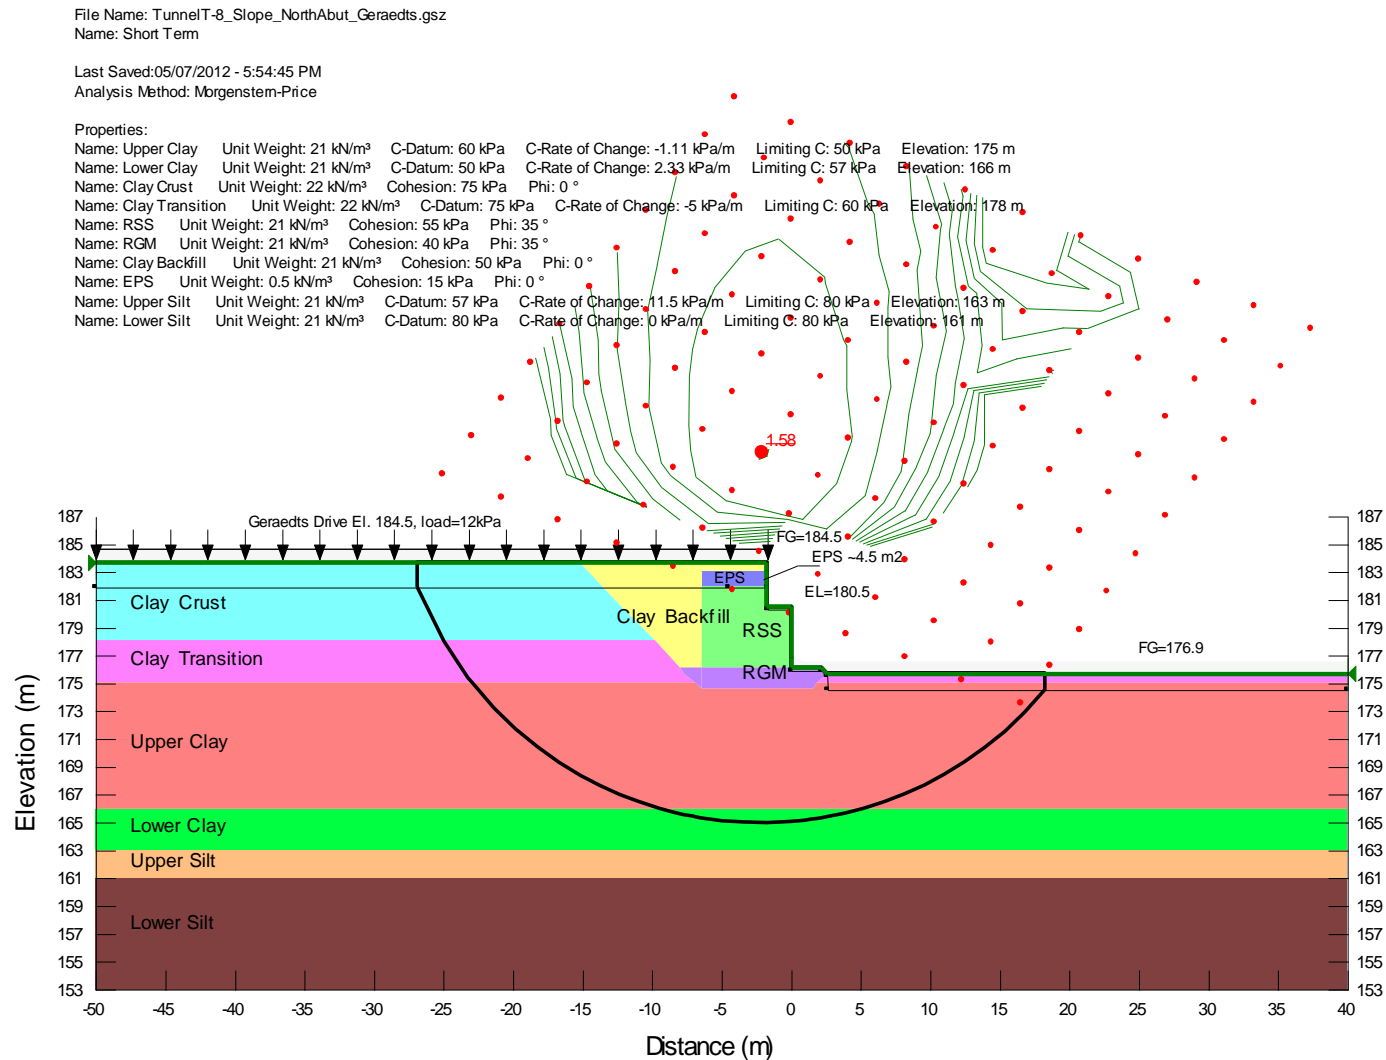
Global Stability Result – North Abutment (Geraedts Drive) – End of Construction (Undrained) Loading
